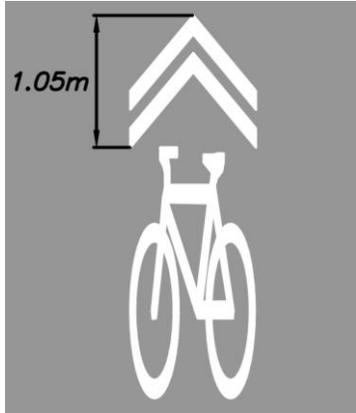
Sharrow Pavement Marking (Source: Draft Alberta Bicycle Facilities Design Guide)
